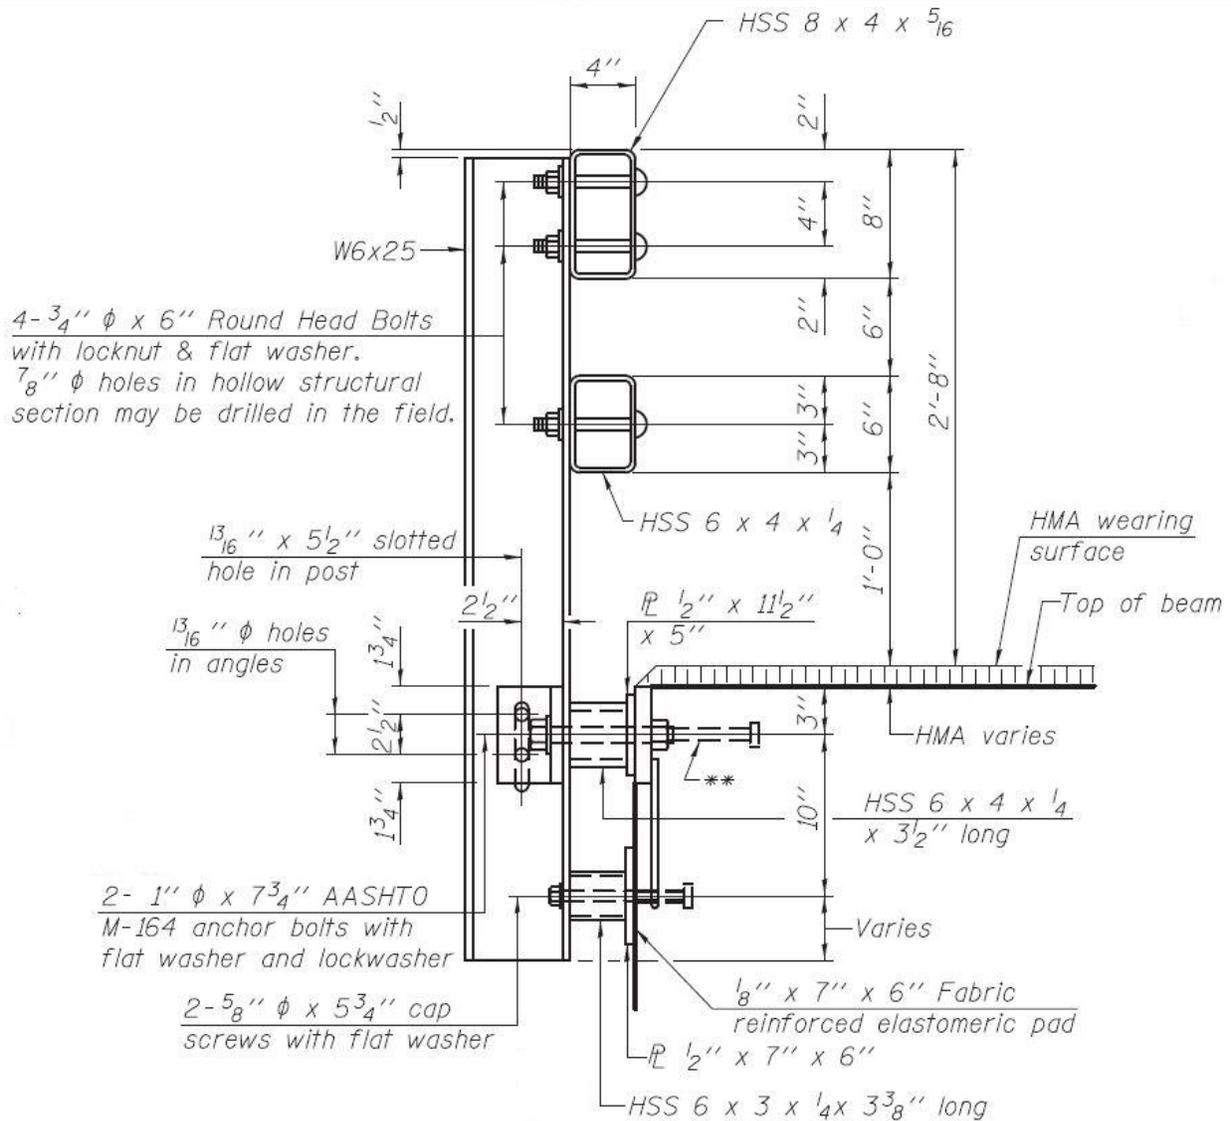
Existing IDOT Side-Mounted Steel Tube Bridge Railing [2]
